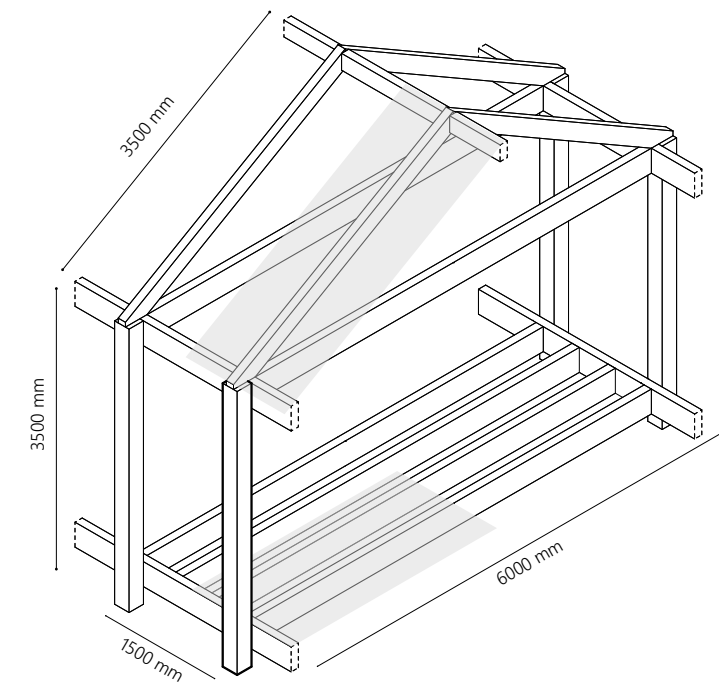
Axonometric drawing with load on the column (Own work, 2024)
